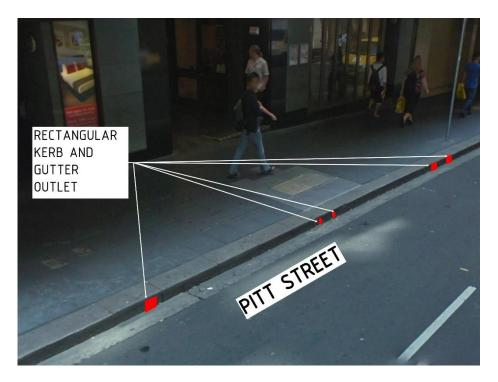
Kerb and Gutter Outlets Pitt St (Google StreetView 16/12/19)
